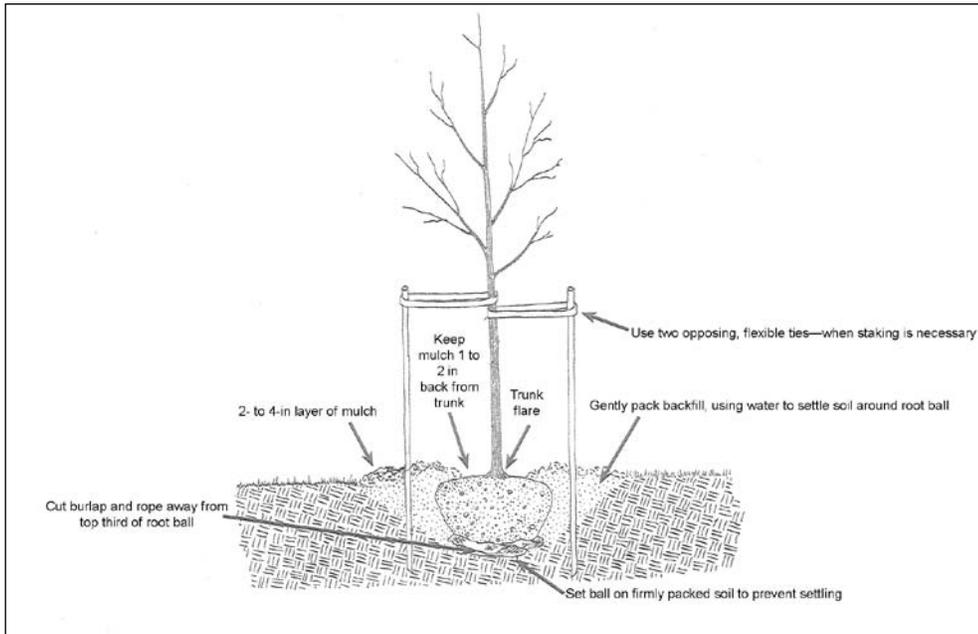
Prepare a broad planting area, plant the tree with the root flare at ground level, and provide a berm/water ring to retain water (drawing courtesy of the International Society of Arboriculture).
